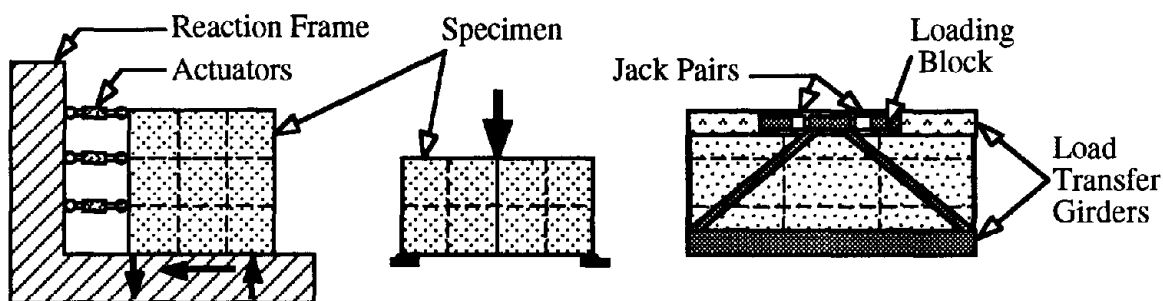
Alternative Loading Arrangements Considered for Composite Wall Tests
